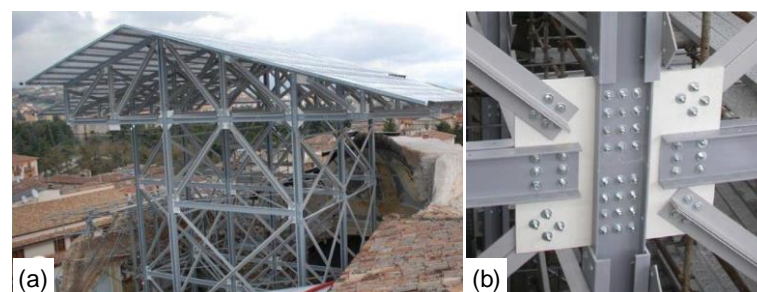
FRP shelter structure for the Santa Maria Paganica church (on the courtesy of TOP GLASS Industries S.p.A. [www.topglass.com](http://www.topglass.com)) [44]: (a) overall view; (b) connection between members.
